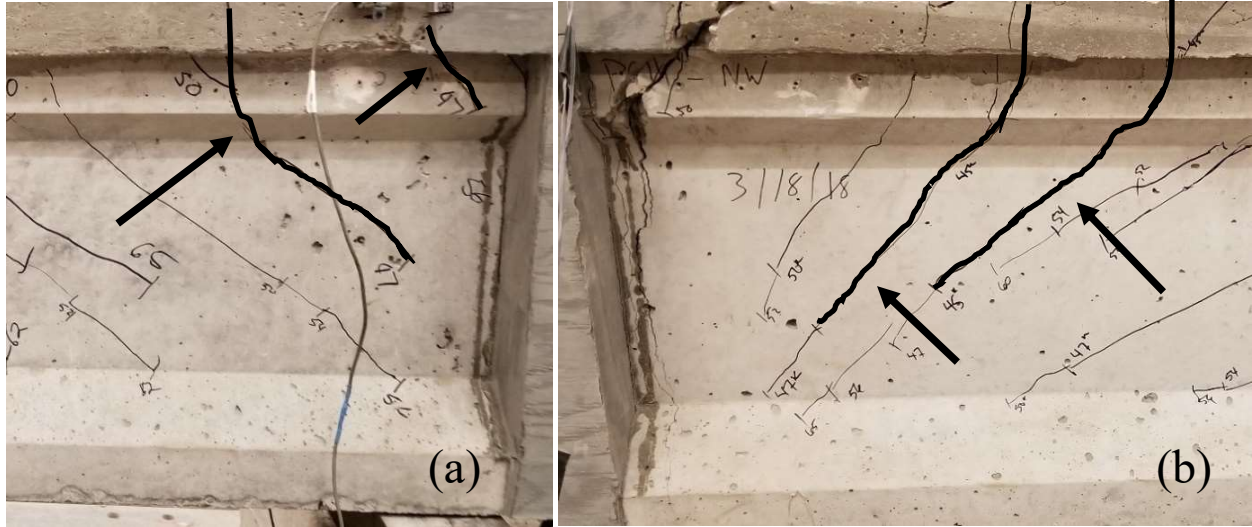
Flexure-shear cracking on the NC2-N girder at 47 kips of load (a) and flexure-shear cracking on the NC2-S girder at 45 kips of load (b). Arrows point to the dark lines that indicate the initial flexure-shear cracking.
